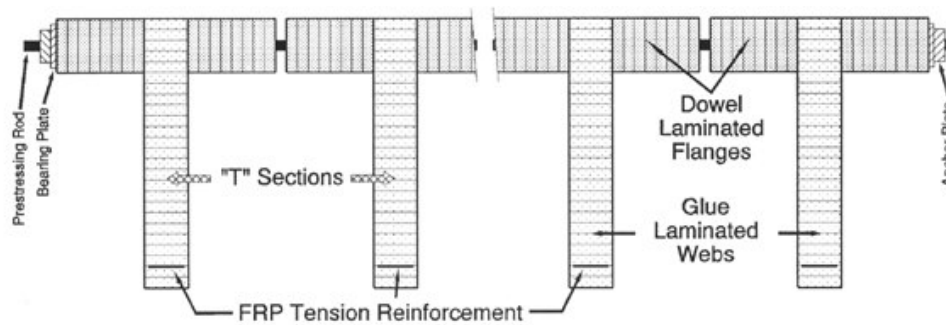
Example of stress-laminated timber section with FRP-reinforcement, [16]
